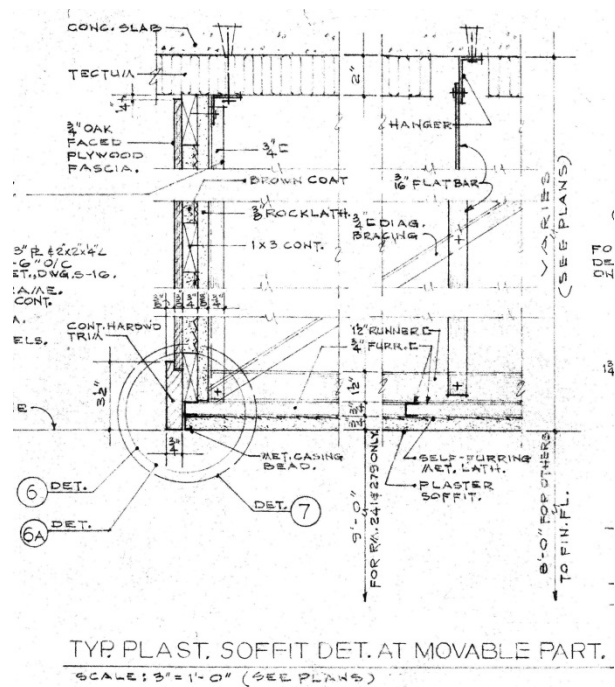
Typical detail of soffit construction at movable partitions. [From 1968 Drawing A-26]
